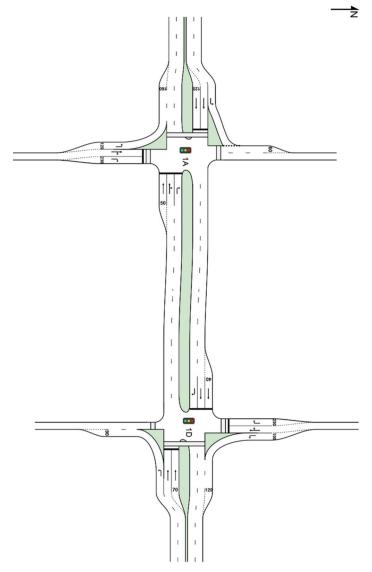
Picton Road / Hume Highway intersection alternate layout
